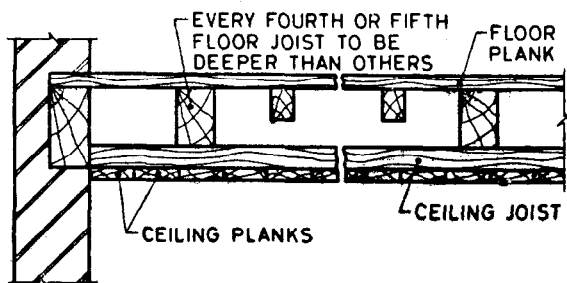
CLOSED CEILING WITH JOISTS AND PLANKS FIXED JUST BELOW FLOOR JOISTS
